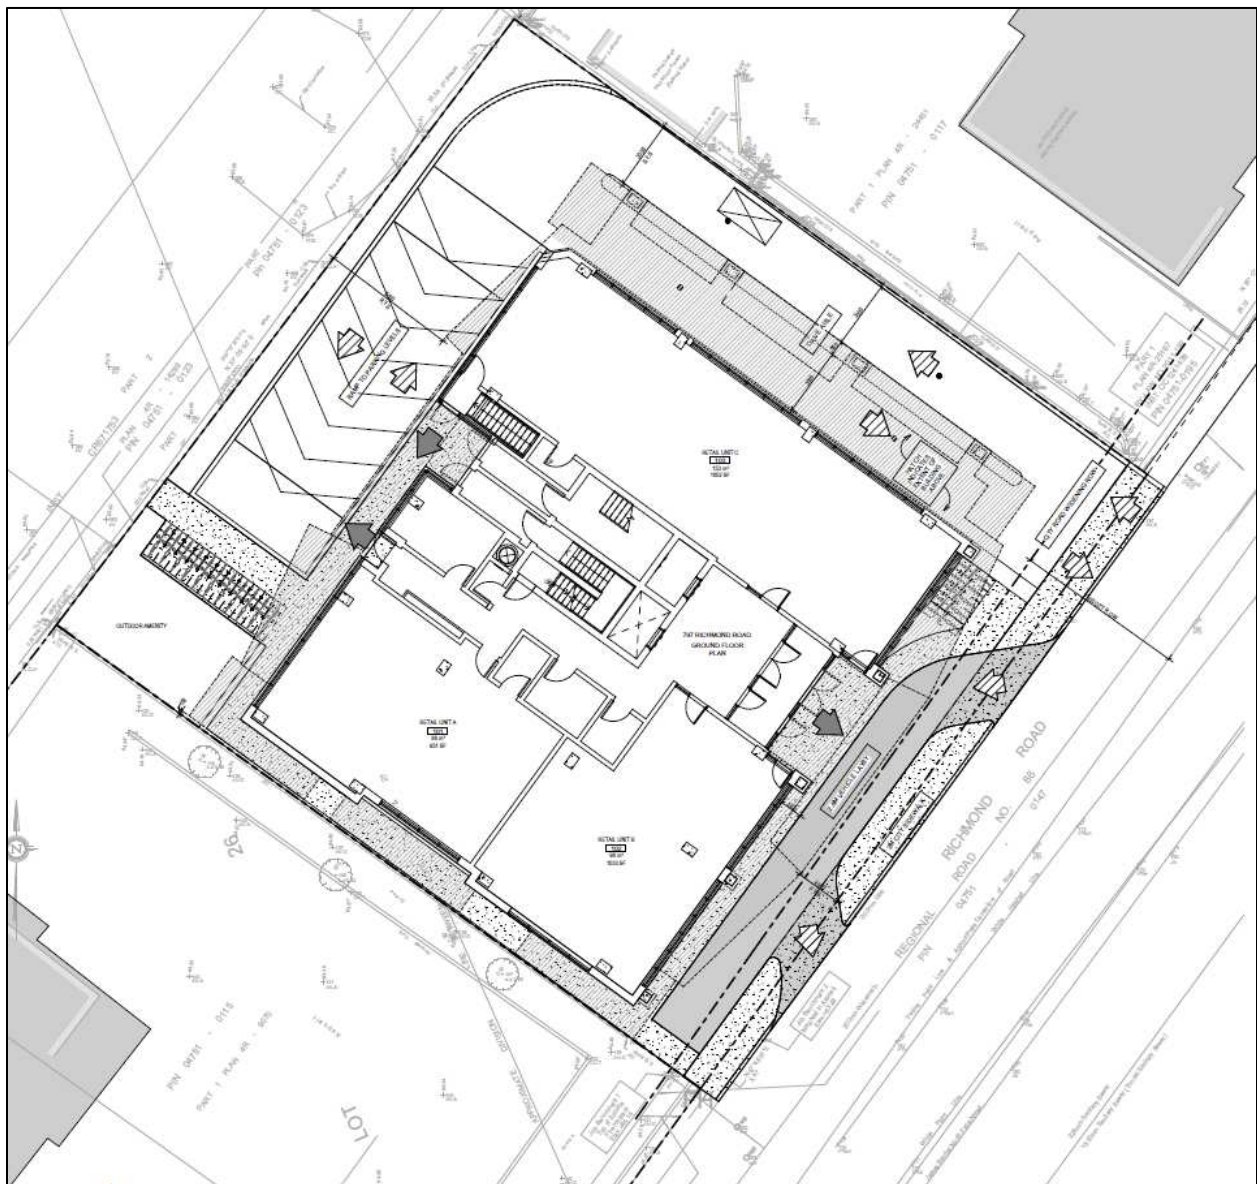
SITE PLAN EXTRACT (CHMIEL ARCHITECTS)
